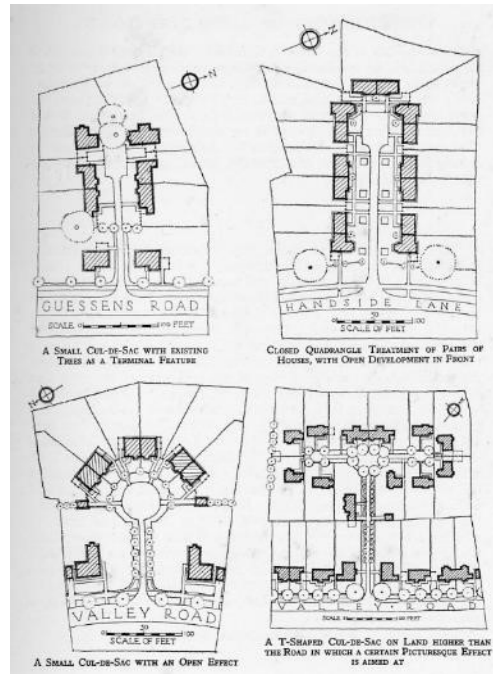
Street layout plan illustrating types of cul-de-sac taken from *The Building of Satellite Towns* by C.B. Purdom
